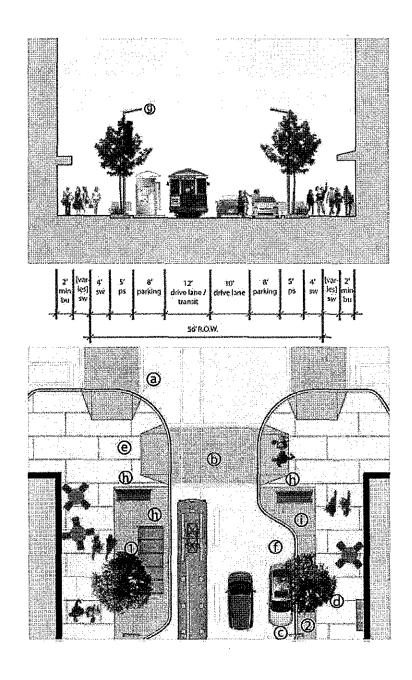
EXHIBIT ___F (Page 2 of 8) Streetscape Standards
